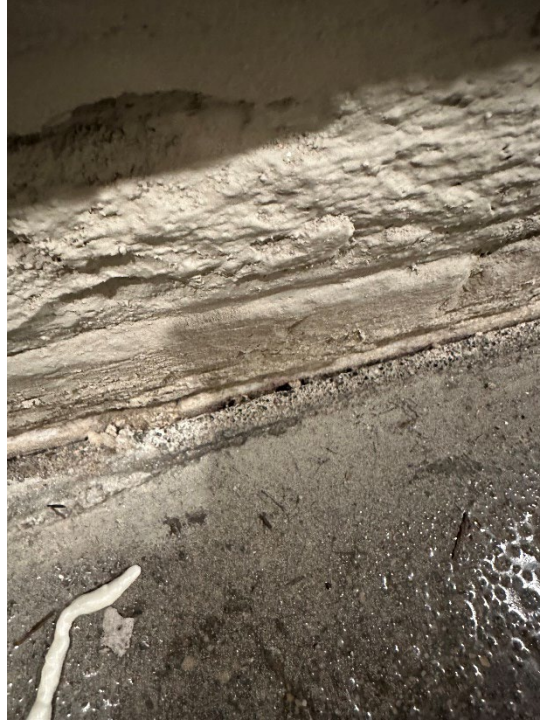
Several gaps of 3+ inches all along the masonry wall and slab
